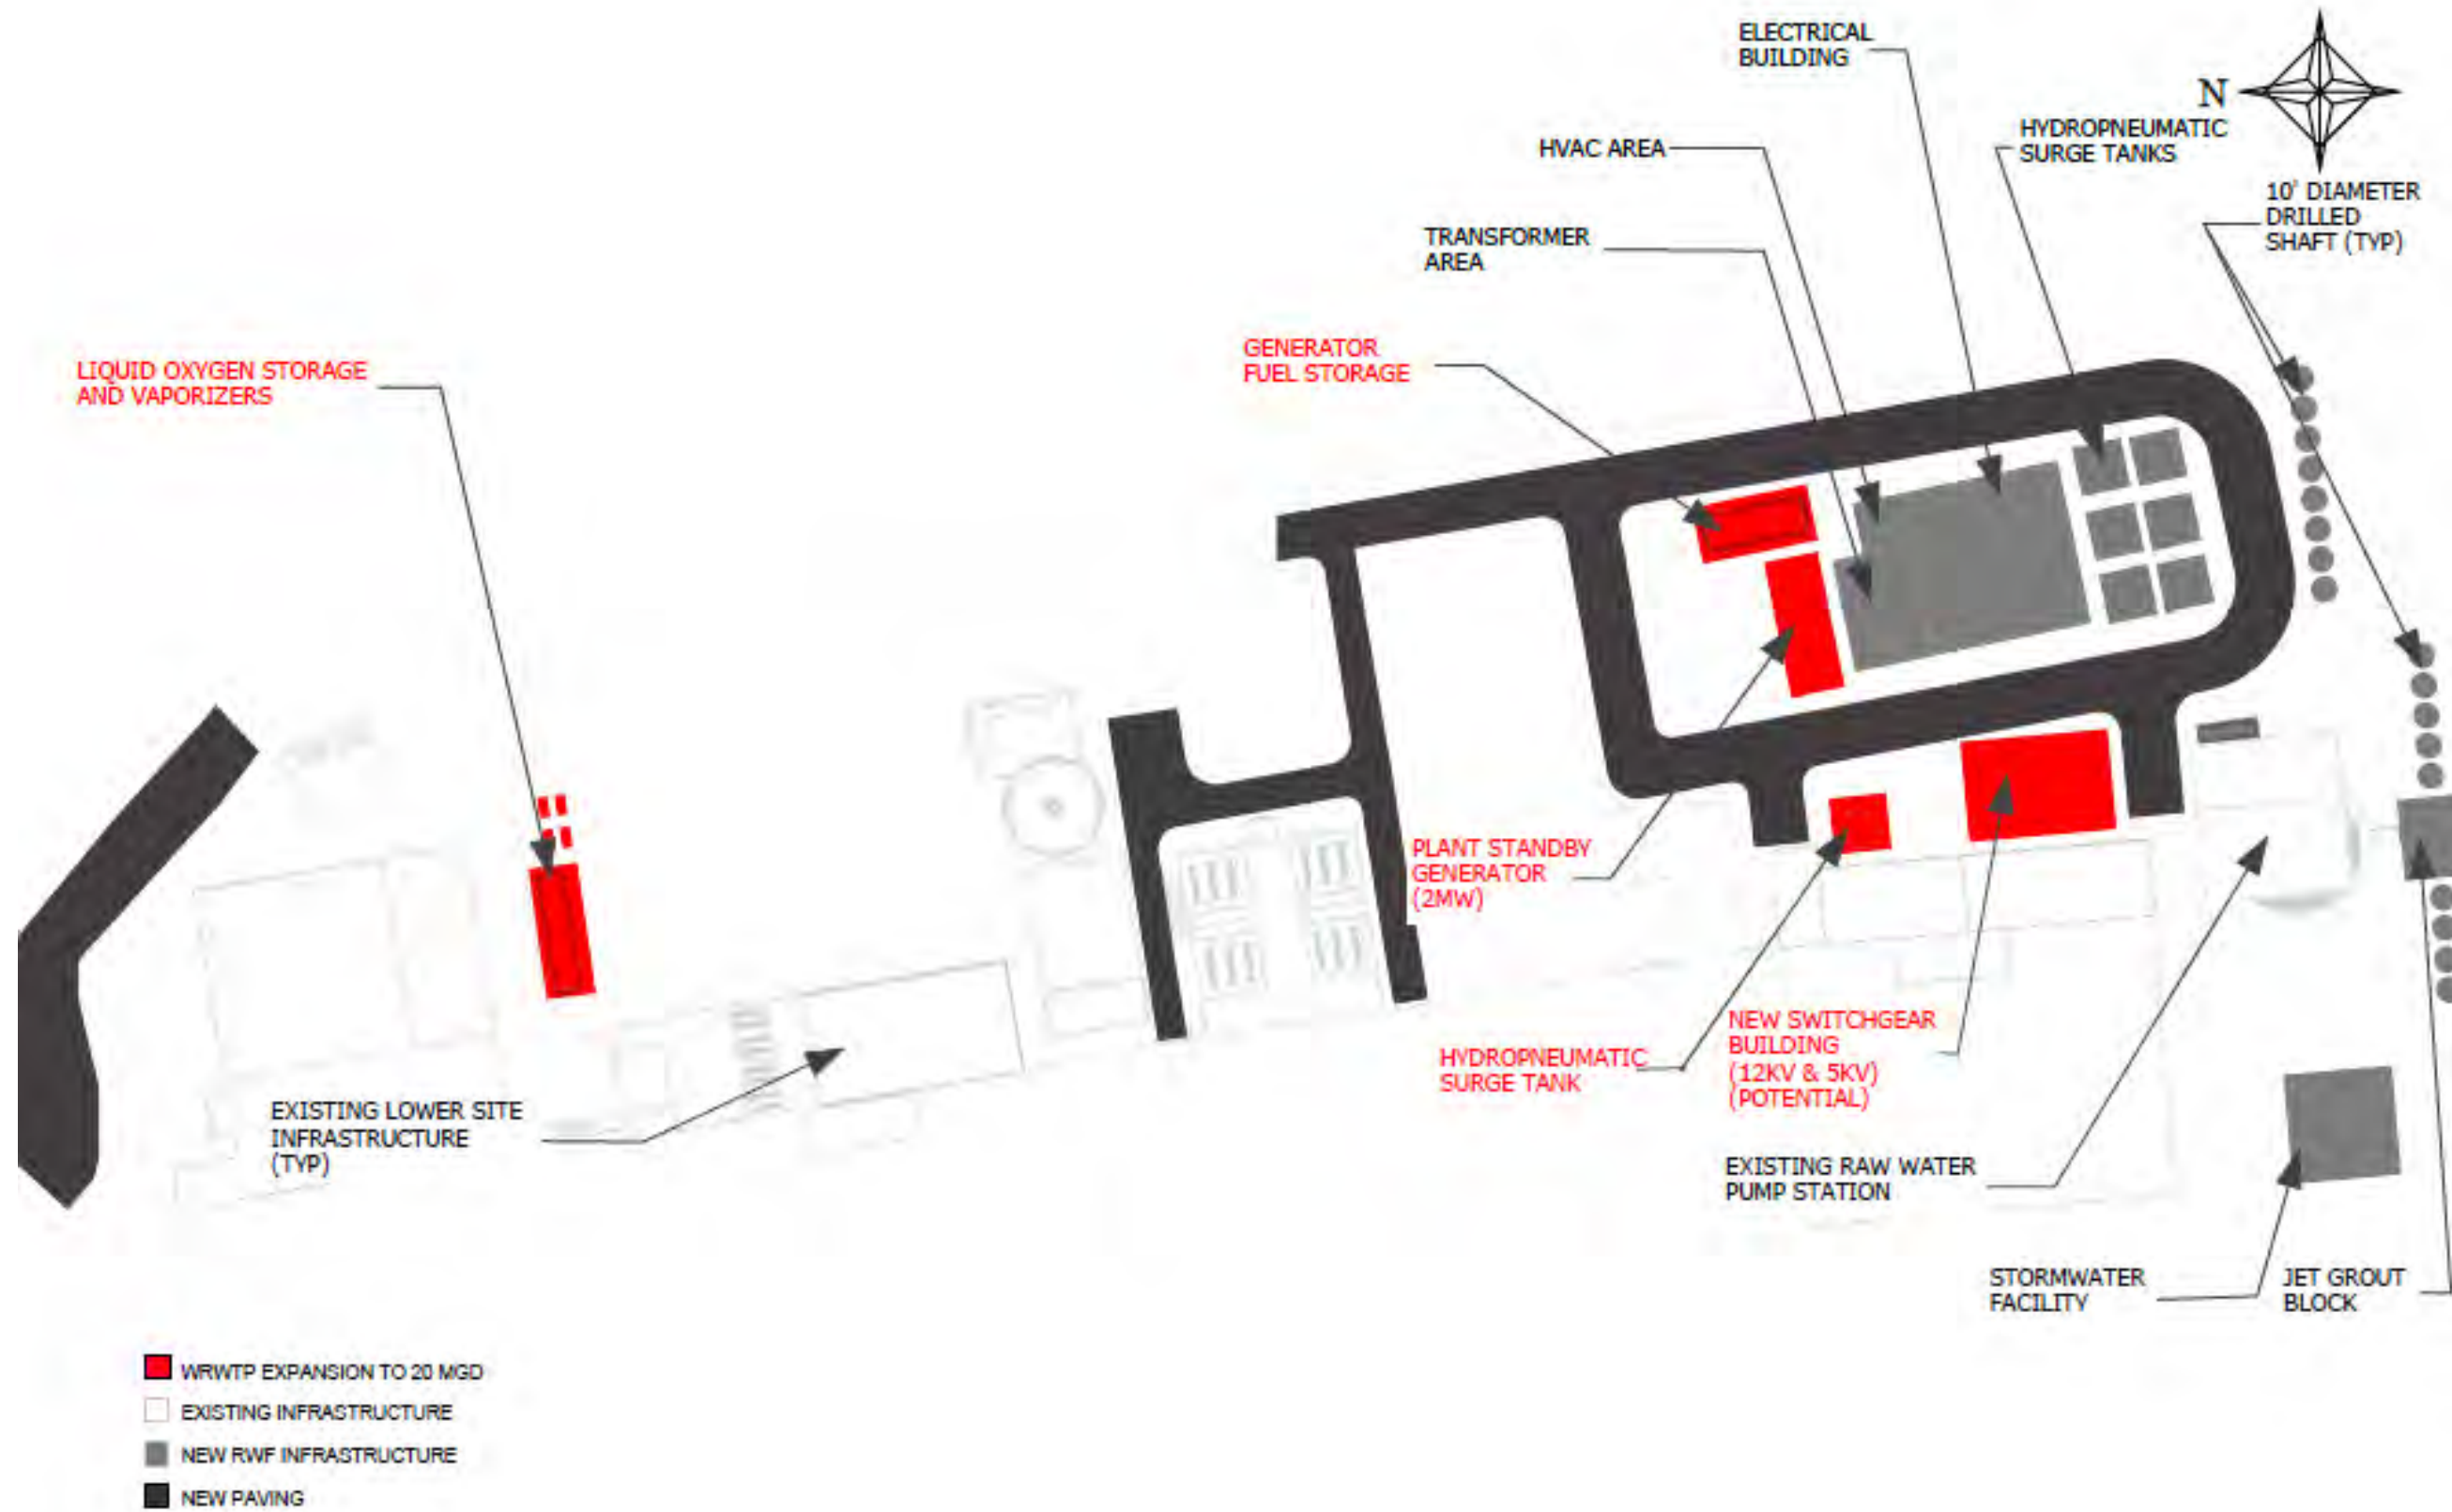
Site Plan – 20-MGD Capacity Expansion
